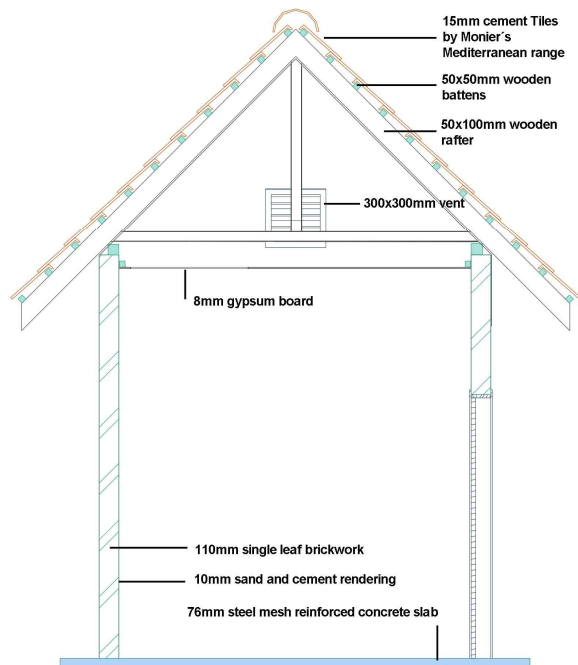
Construction detail of Test Cell 1, without aluminium foil
